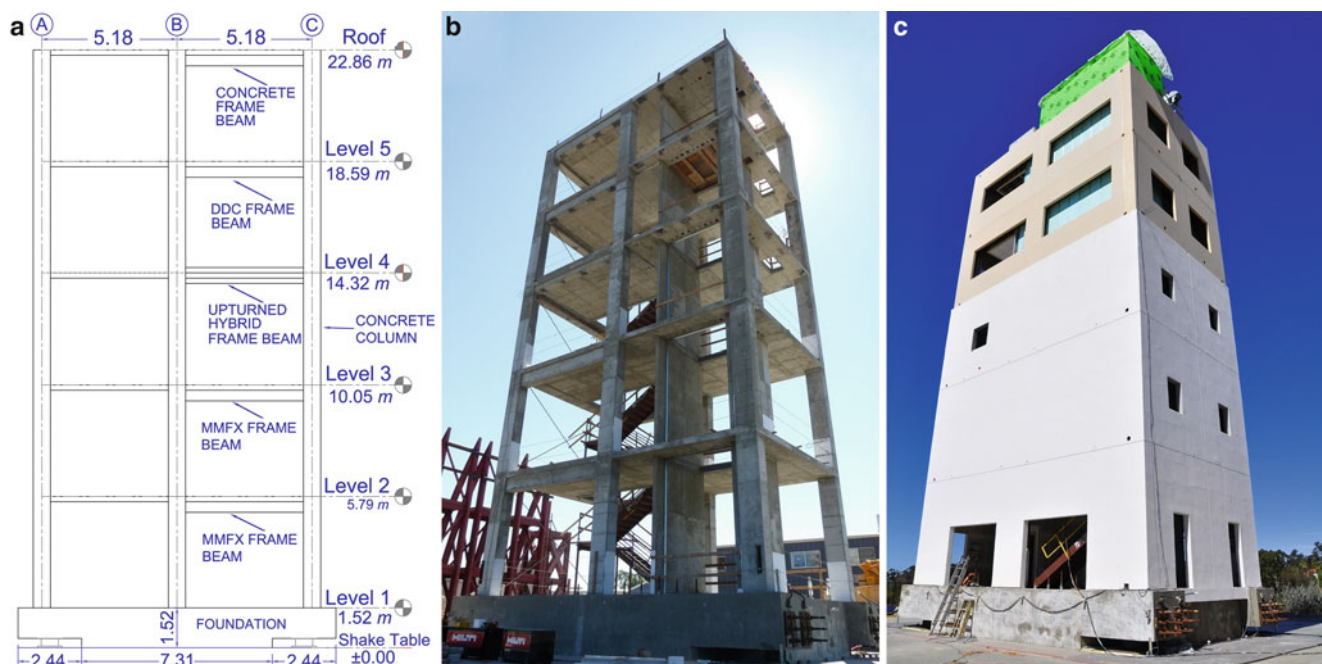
(a) Schematic view of the test specimen, (b) bare structure (August 12, 2011) and (c) complete building (February 23, 2012)
